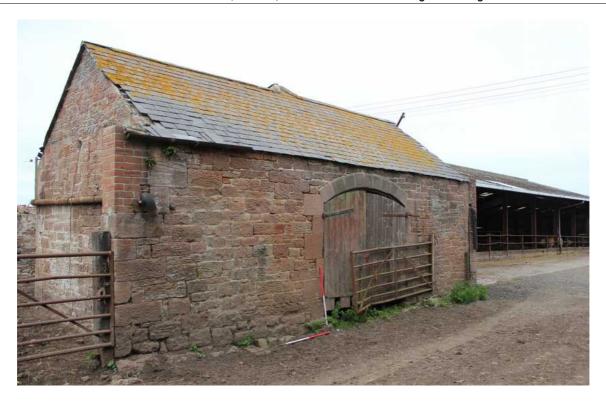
Building A, facing north-east, showing double door and later brick repair.
